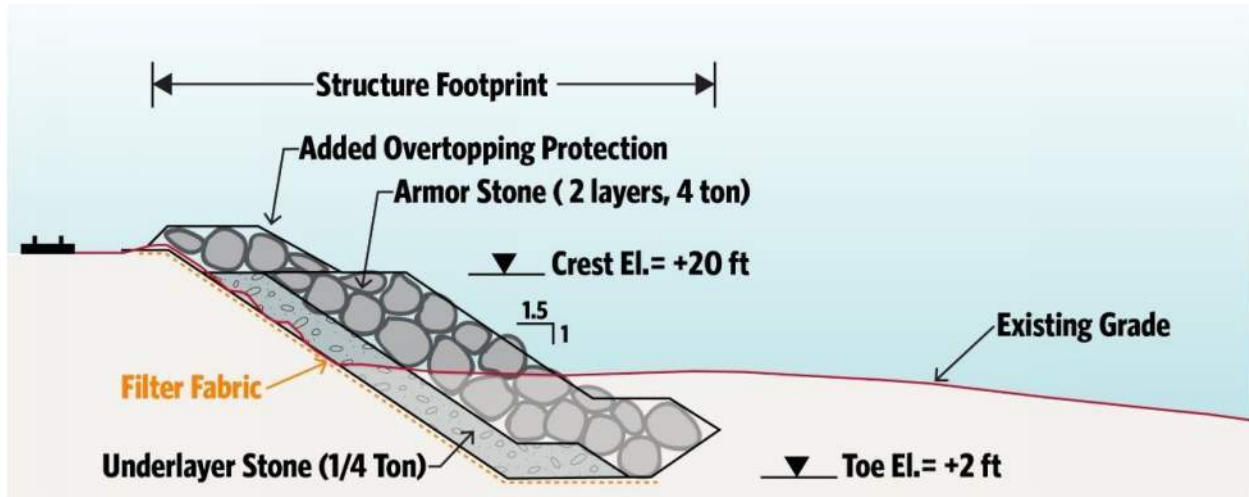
Potential Solution for Reinforcement Site 4 with Engineered Revetment Section
